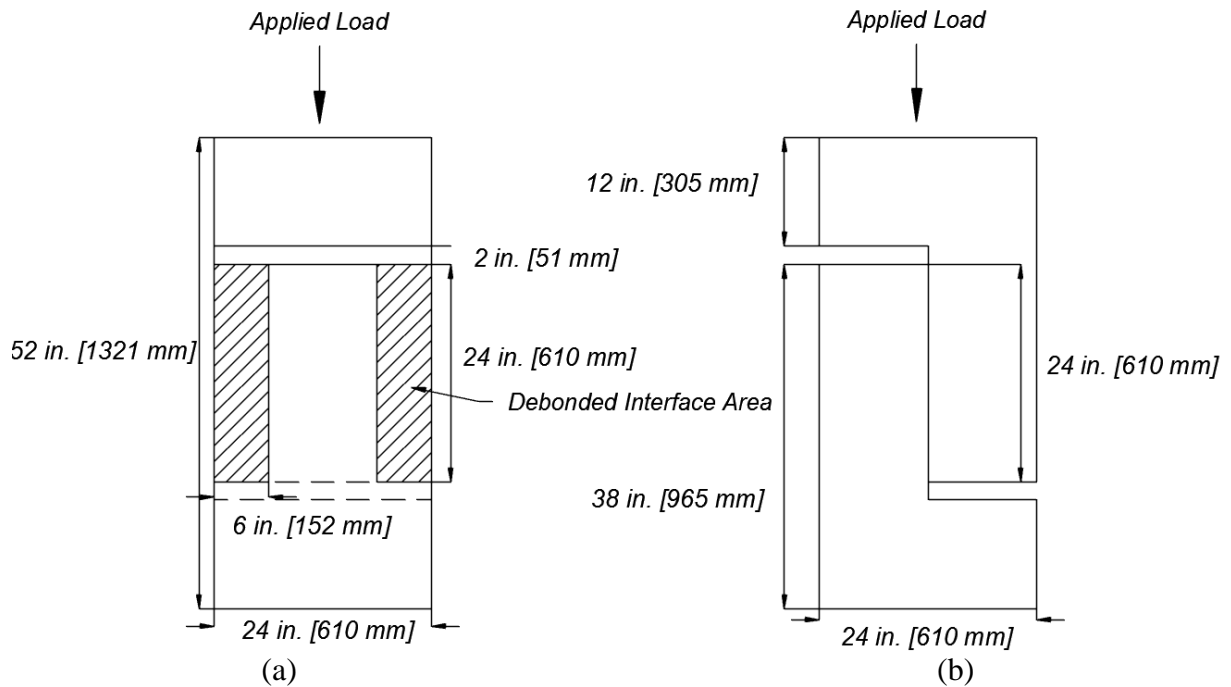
Test elevations for the specimens containing #5 (#16M) reinforcing bars across the interface: (a) Front view elevation, (b) side view elevation
